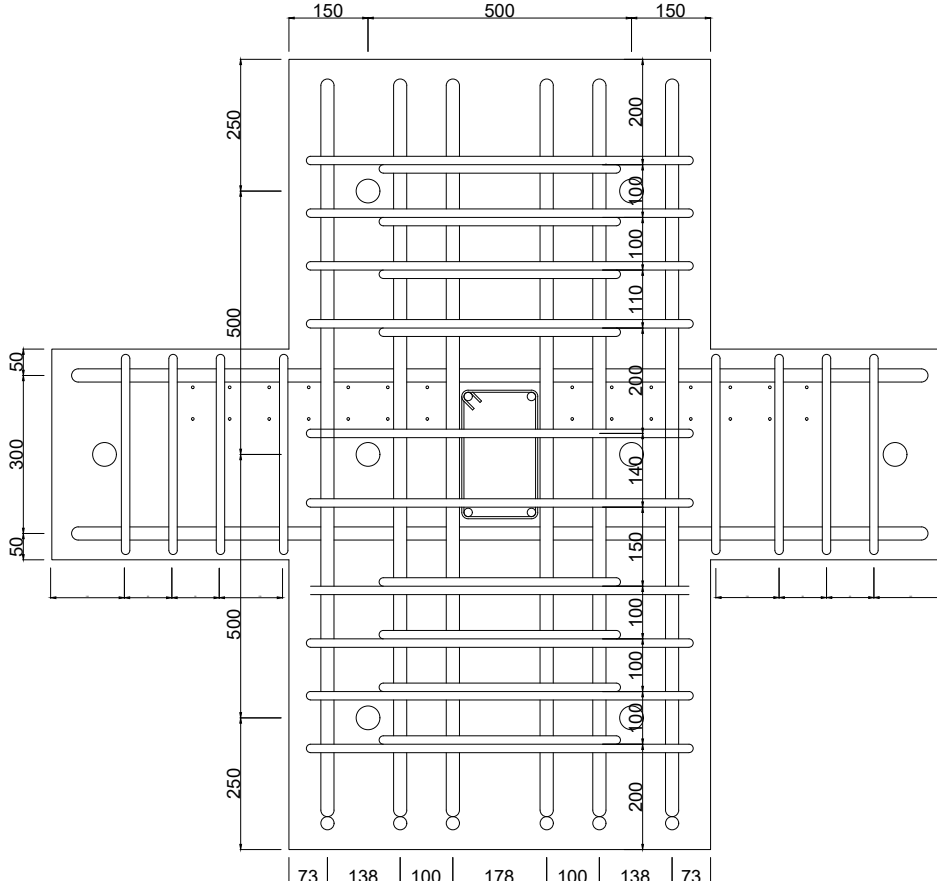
Dimensions and reinforcement details of SP-S5-Slab T
